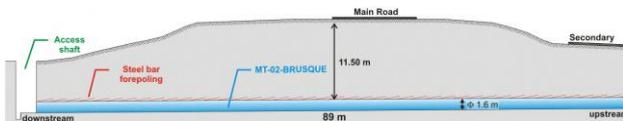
Microtunnel MT-02-BRUSQUE basic plan.
